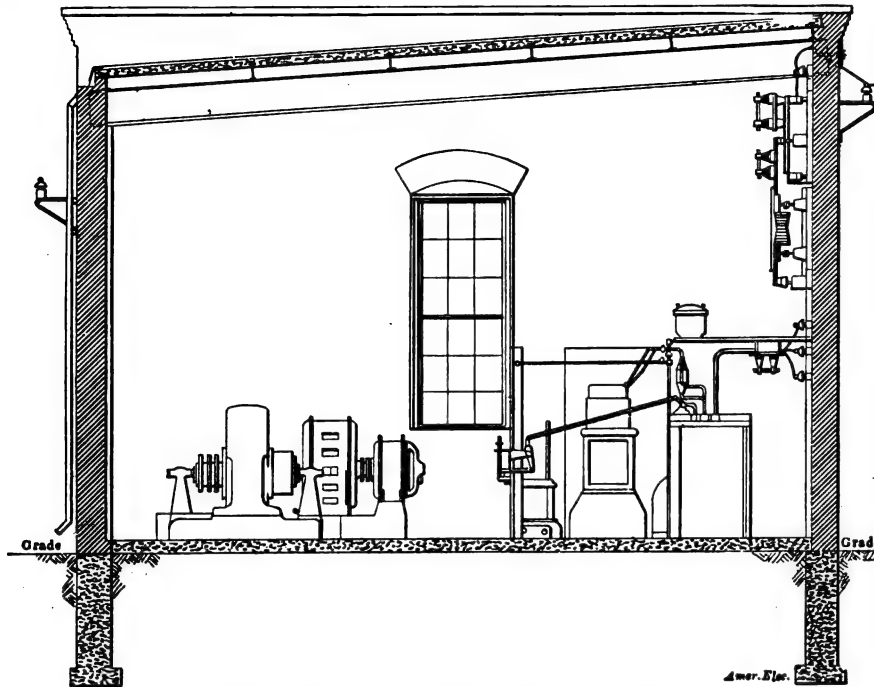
SECTIONAL ELEVATION OF SUB-STATION.
